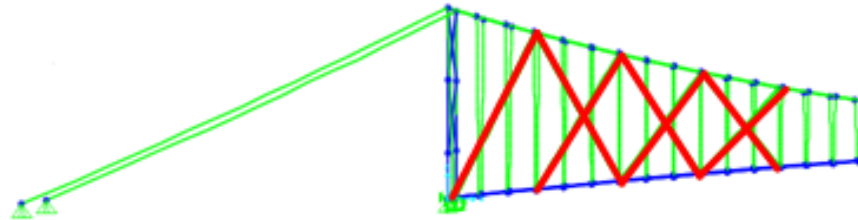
Vertical Bracing Pattern at Ends of 60 m Span Footbridge
